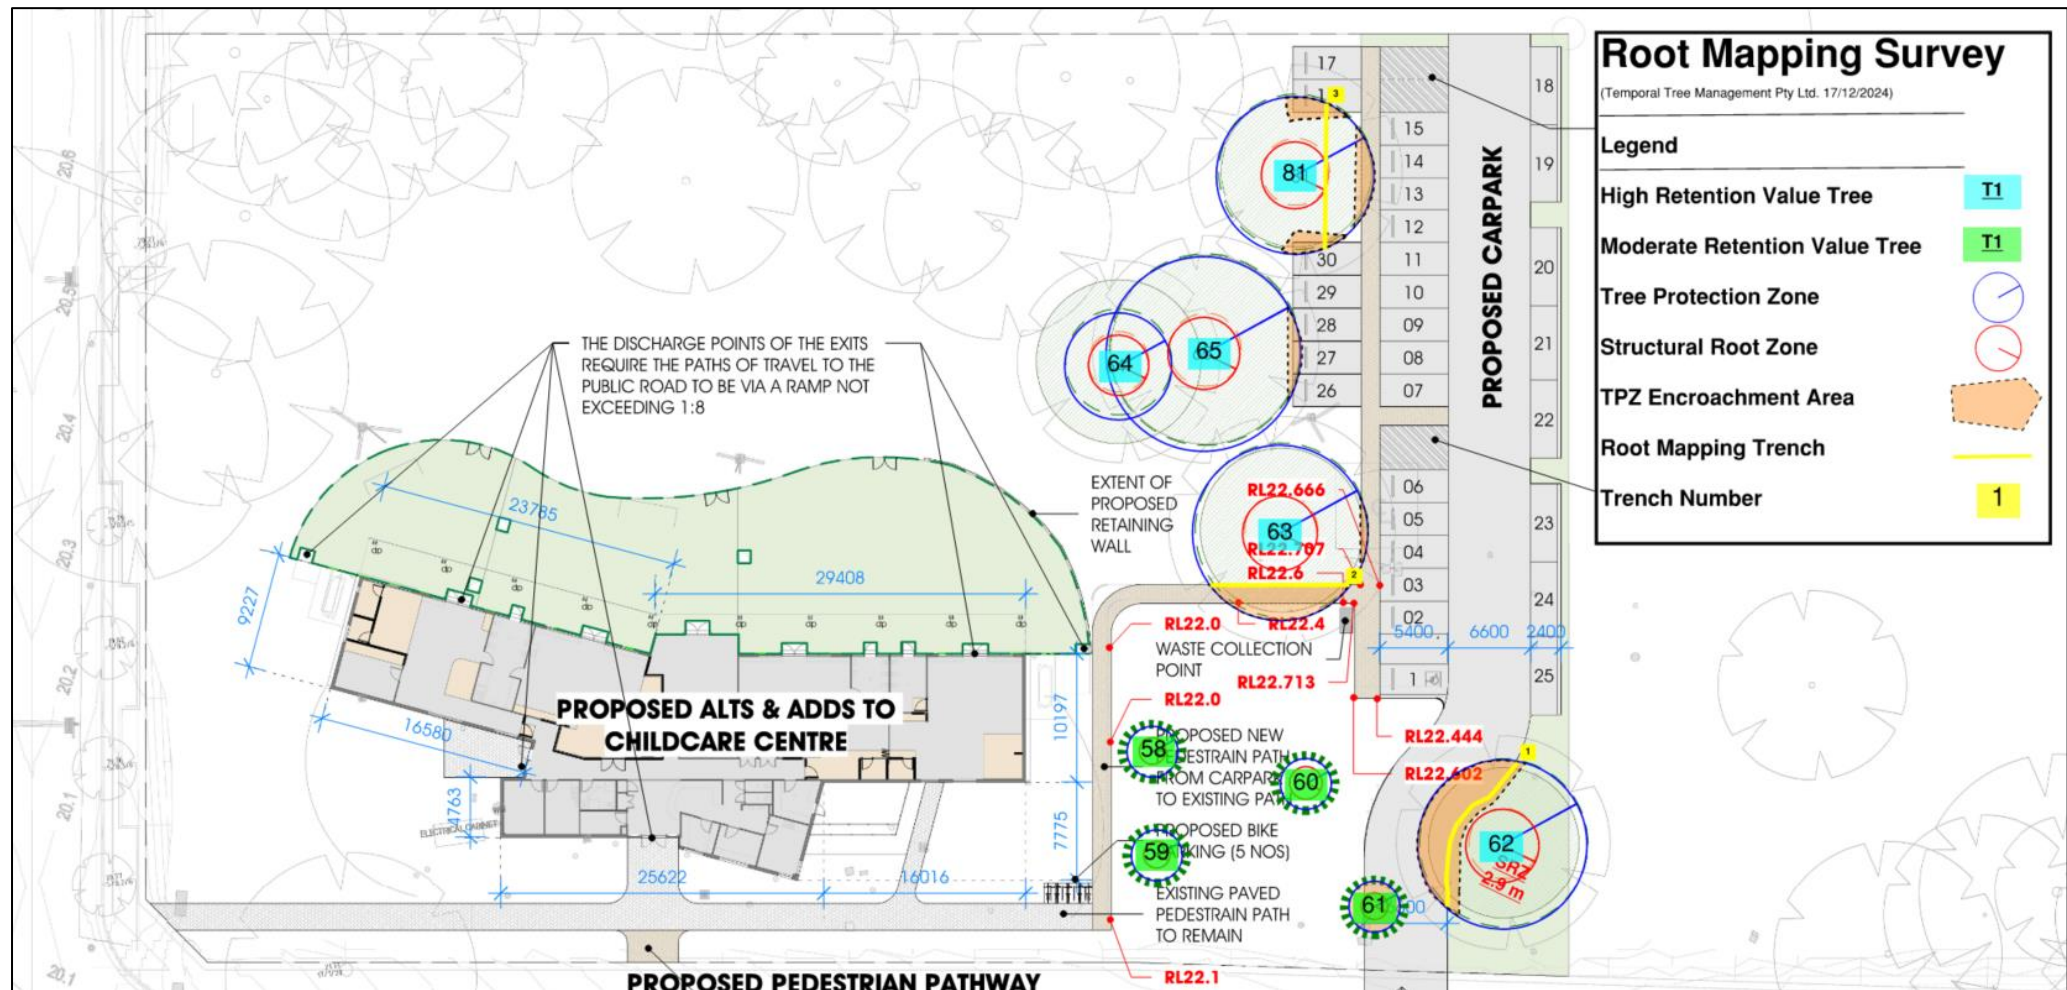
Position of three survey trenches that was non-destructively excavated within the TPZs of Trees 62, 63 and 81. *Proposed Site Plan*, prepared by Envision Group Pty Ltd. (Project No: 194, Drawing No: DA-06, Rev: I, drawn: 11/12/2024). Annotated by Temporal Tree Management Pty Ltd. (17/12/2024).
